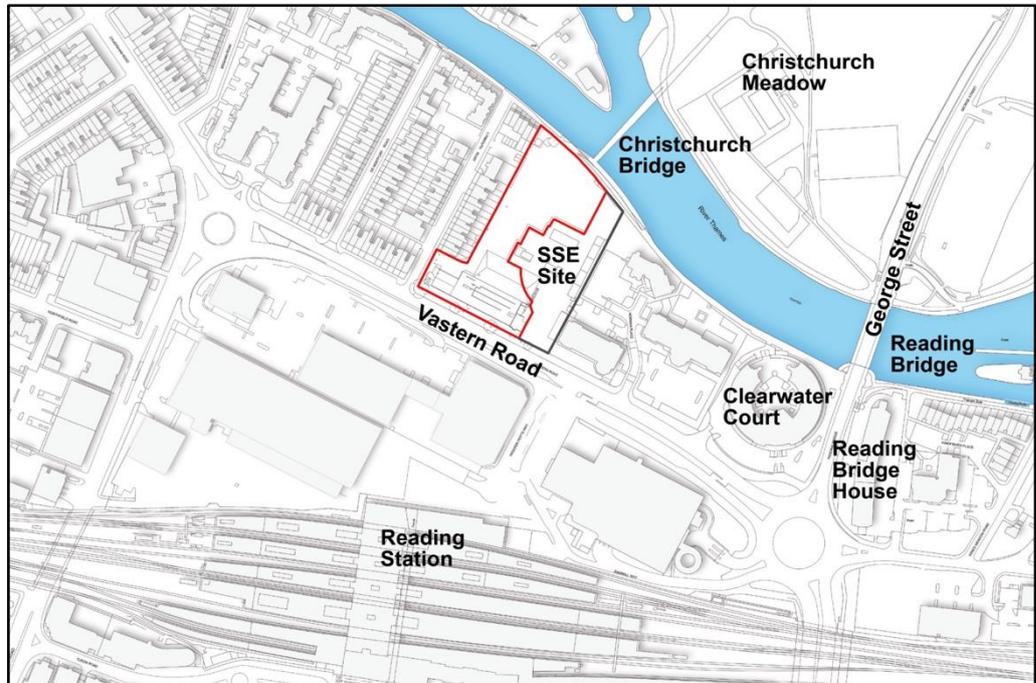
Wider site location plan, orientation with north to the top of the plan
